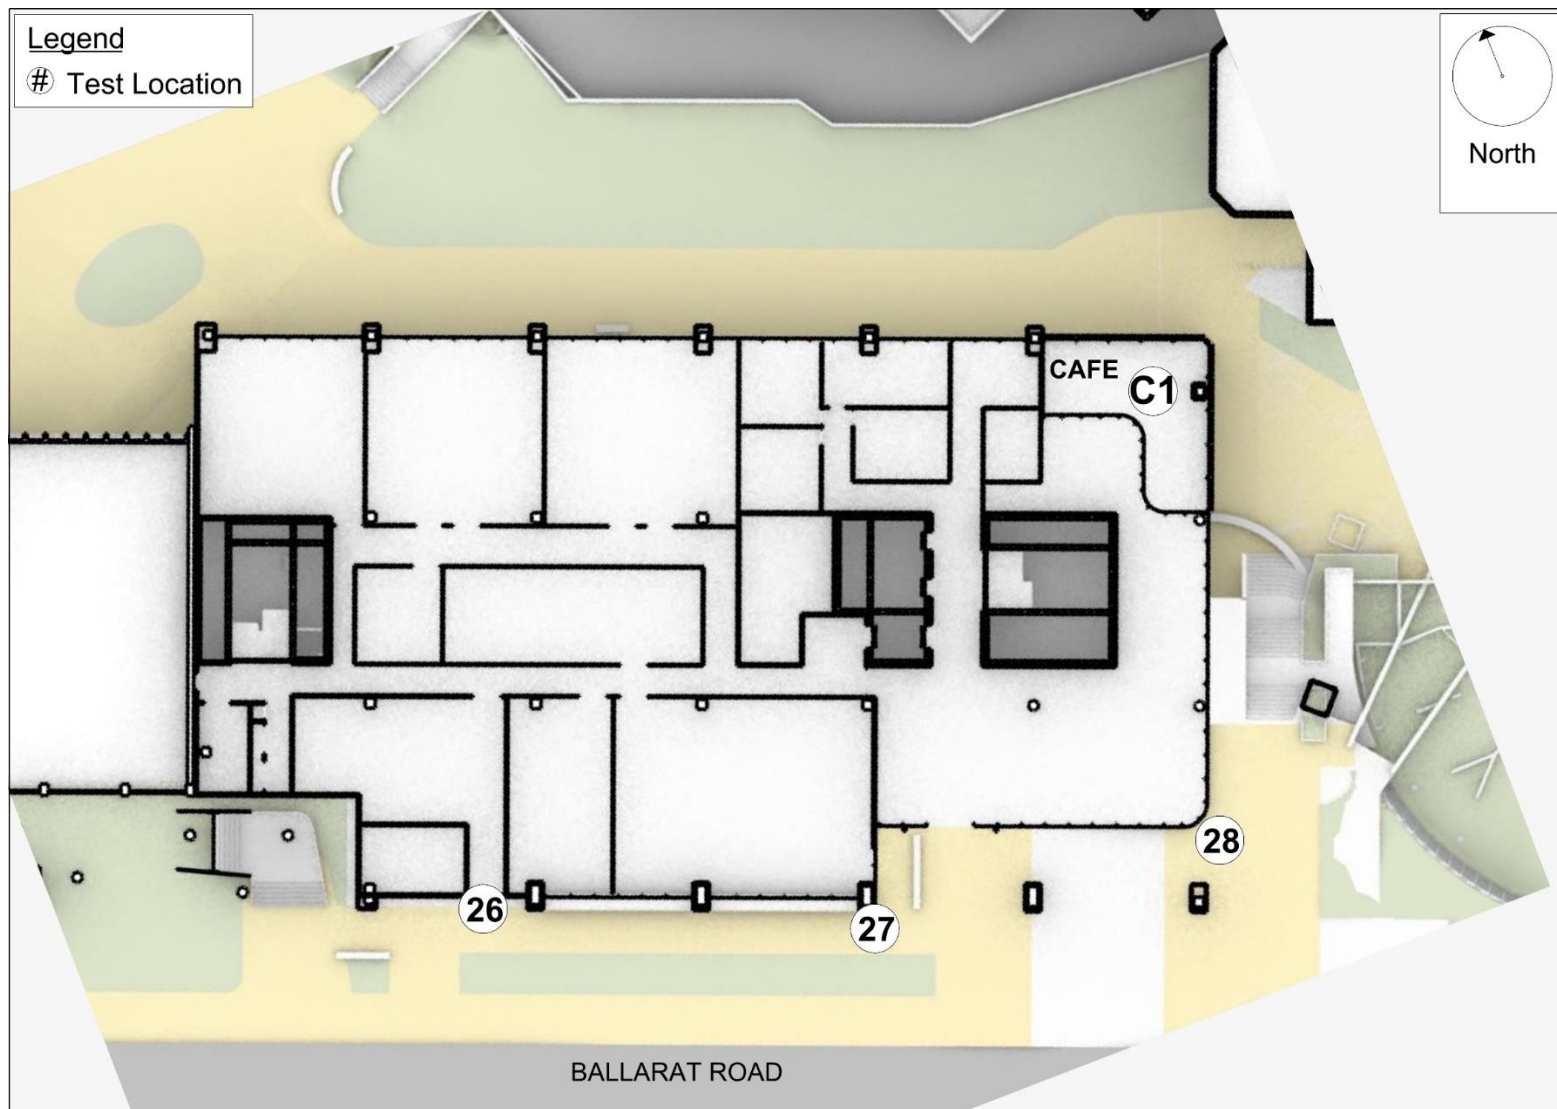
Test Locations along the Ballarat Road Frontage and café area of the proposed VU CHTF Development.
